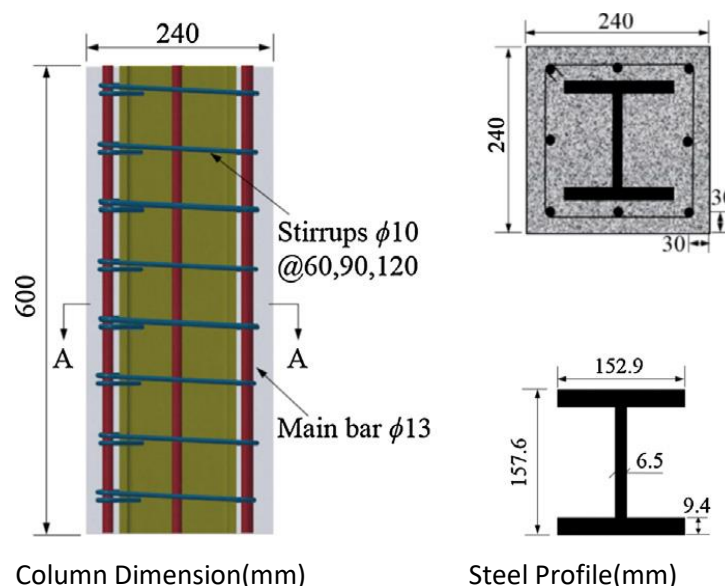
a Dimension details of specimen(Lai, Liew and Xiong, 2019)
